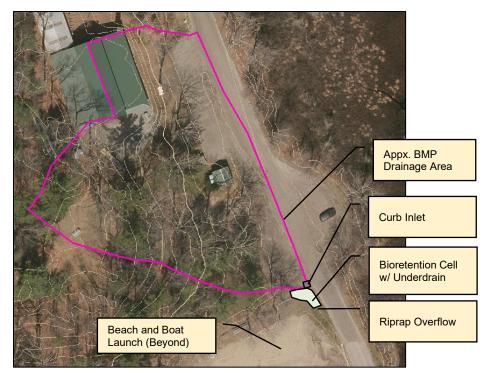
Proposed Improvements at Litchfield Town Beach and Boat Launch.
